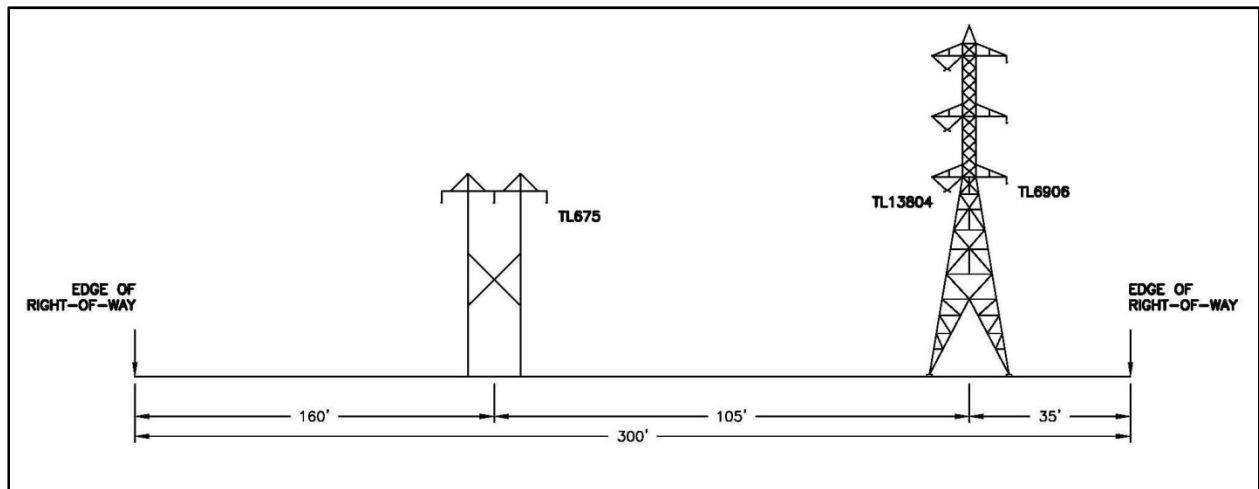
Segment D Existing ROW Cross Section (View West)
